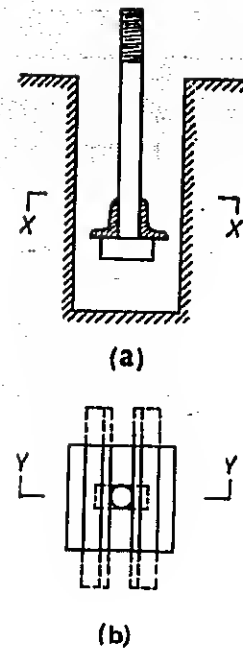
Typical Detail of a Bolt Hole Close to Edge. (Dimensions in mm.)
